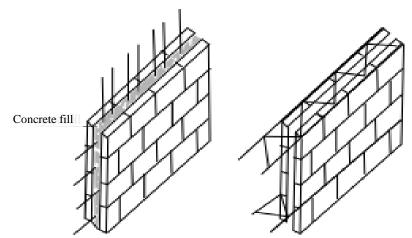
Stone or brick masonry wall with cavity wall and steel bar reinforcement (By Author)
